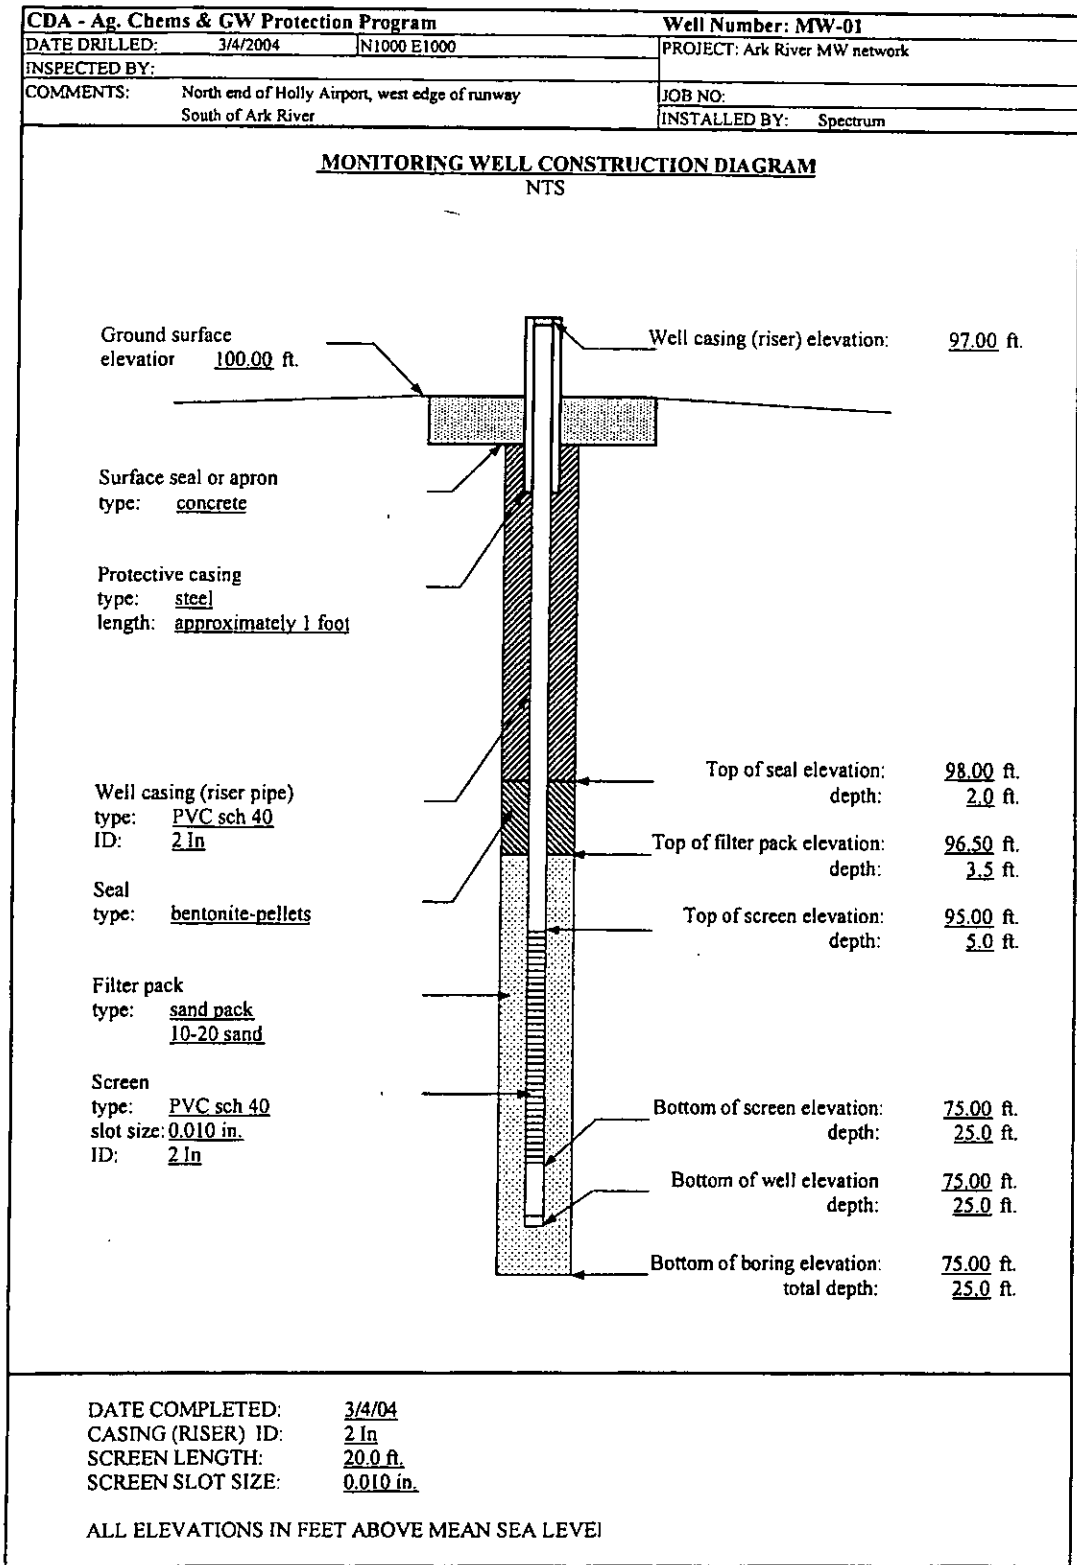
Typical construction diagram for Arkansas monitoring wells.
